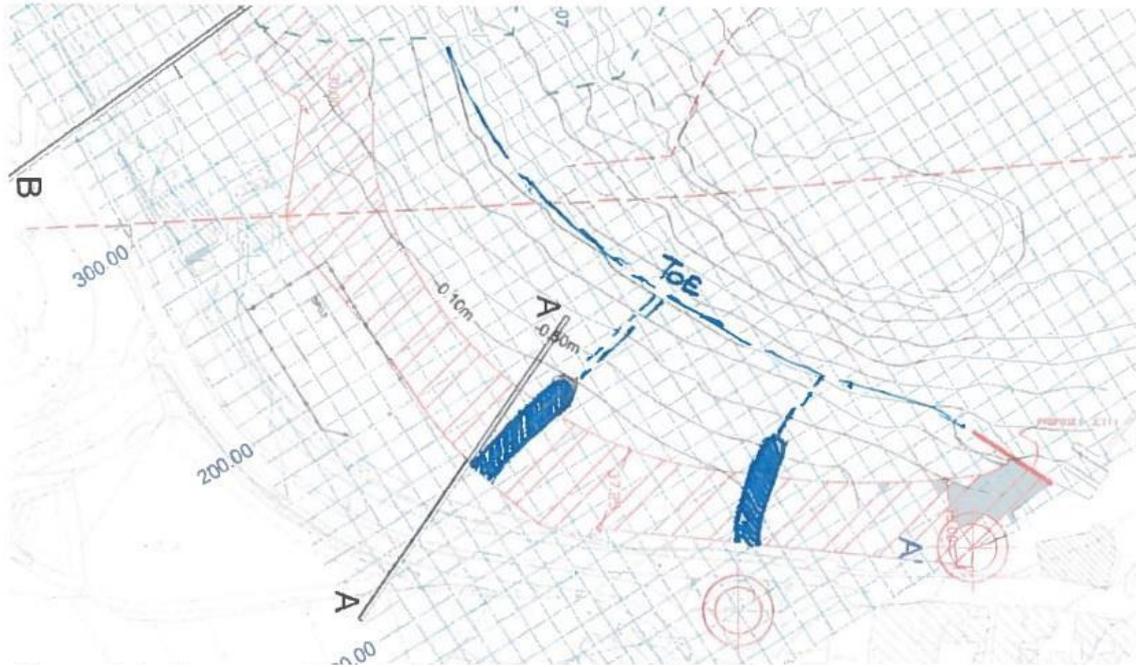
Proposal plan (The area for the proposed extension of the beach outlined in red, and the area proposed for all interventions related to dredging and construction of the wave deflector, submerged toe and groynes, outlined in blue) (Source: PDS)
